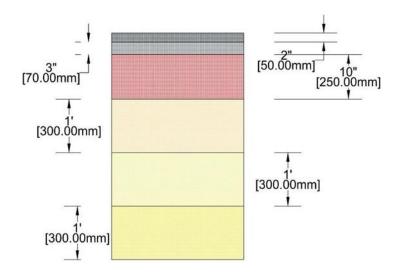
Case:3 Design layer thickness of Flexible Pavement
